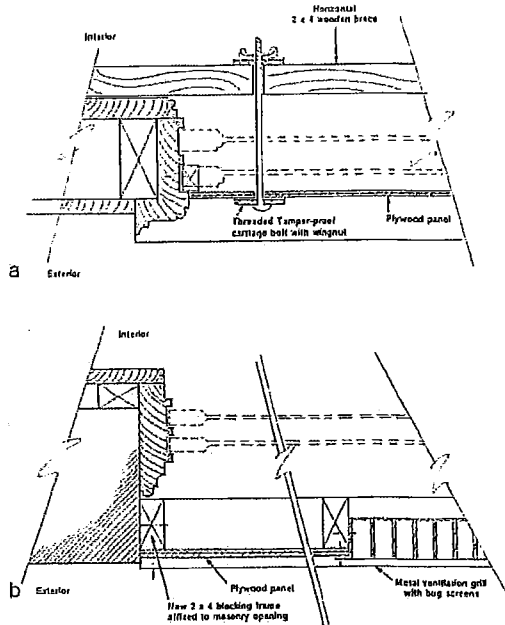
A: Plan detail showing plywood security panel anchored with carriage bolts through to the inside horizontal bracing, or strong backs. B: Plan detail showing section of plywood window panel attached to a new pressure treated wood frame set within the masonry opening. Ventilation should be included whenever possible or necessary.
